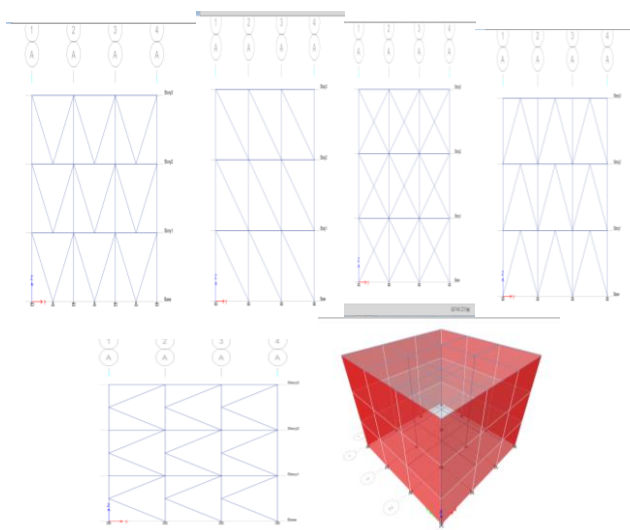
Shows models of Regular building with bracing 1, 3, 5 and 10 storeys structures, and 3D model of shear wall.
